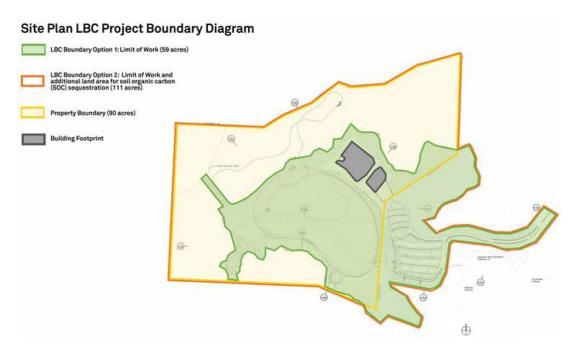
TRPL Site Living Building Challenge, Proposed Project Boundary
